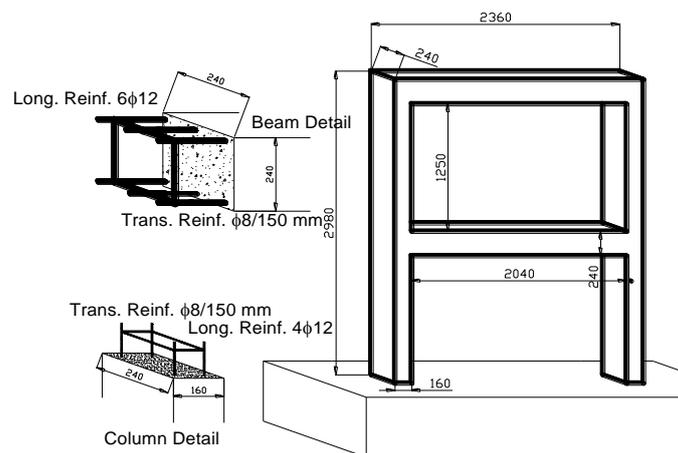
Dimensions and reinforcement details of the test frames (in mm)
